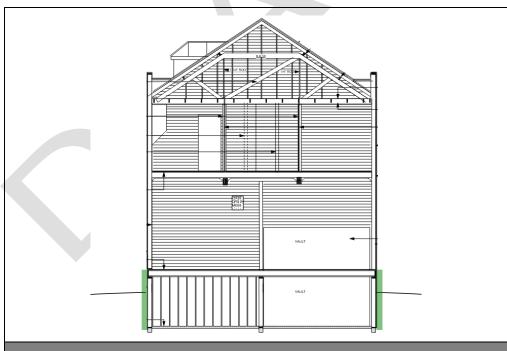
Exterior insulated below grade wall: insulation is installed at the plane of the exterior sheathing. Placement of the plane of the insulation is shaded green (drawing underlay source: Keay Architecture Ltd.).
